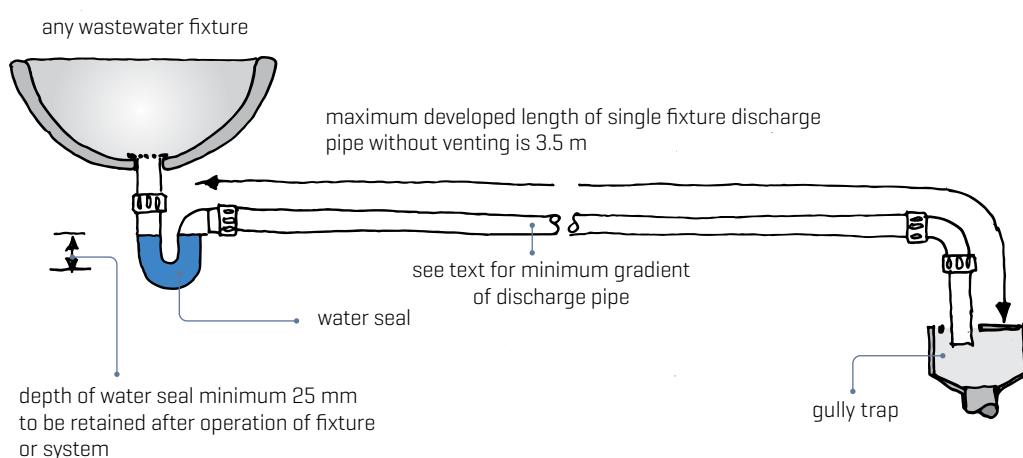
Discharge pipe from wastewater fixtures to gully trap.
